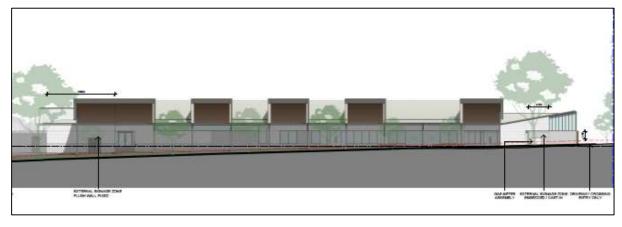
| School building as viewed from Culloden Road (Source: Applicant's supplementary information 2021)
